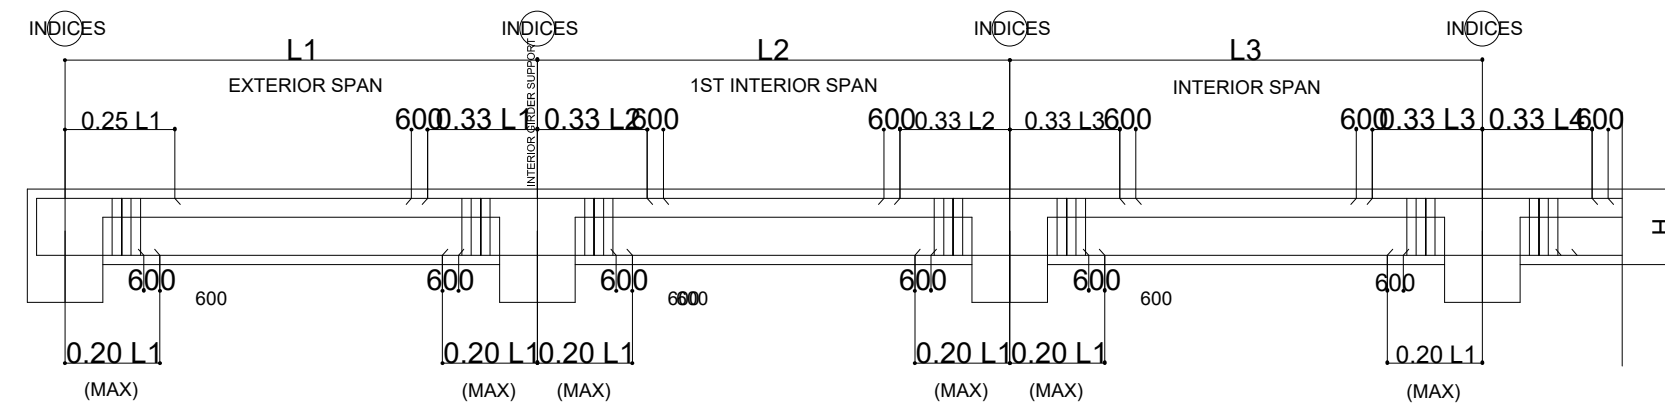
TYPICAL BAR DETAILS FOR BEAMS
